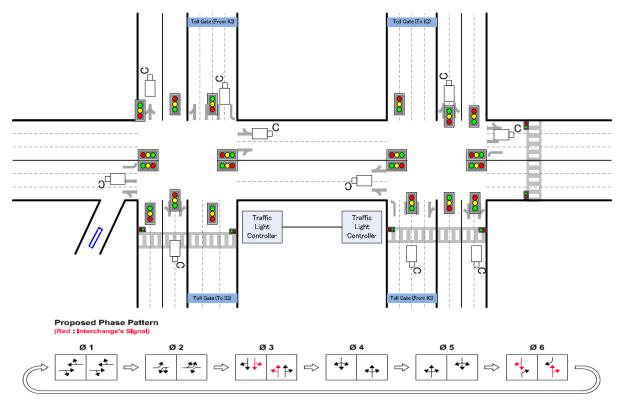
EQUIPMENT ARRANGEMENT PLAN FOR SUCAT INTERSECTION
